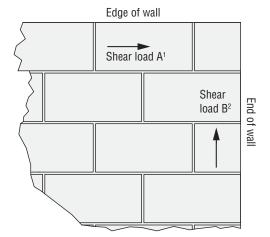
Direction of Shear Load in Relation to Edge and End of Wall
